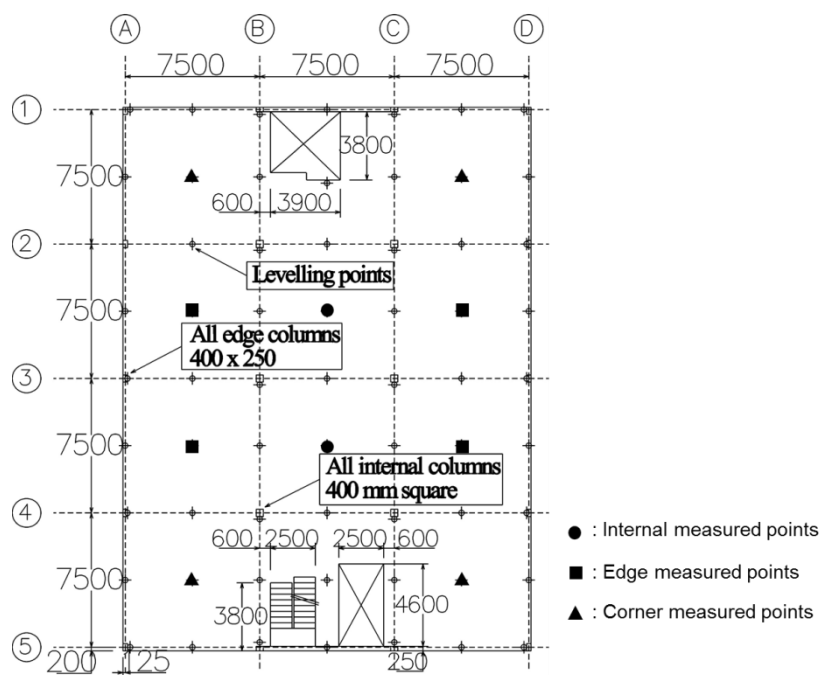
Plan of Cardington in situ concrete building (Vollum *et al.* 2002)
